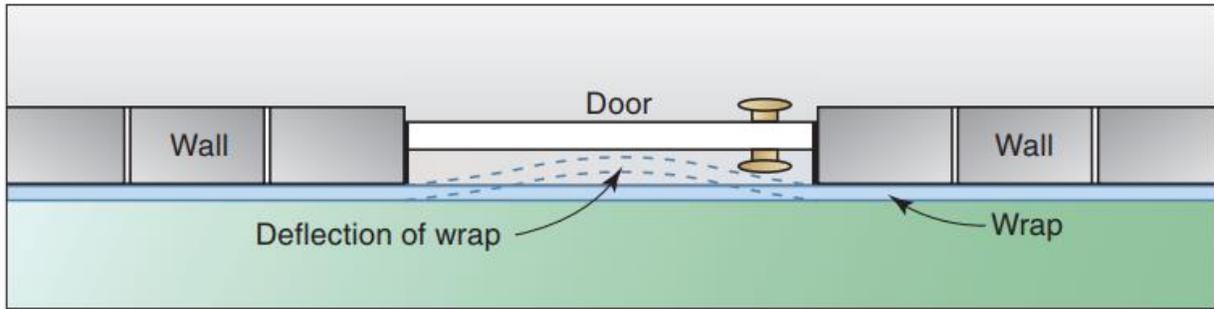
Plan View Shows Deflection of Wrap at Doorway (FEMA 2013)
